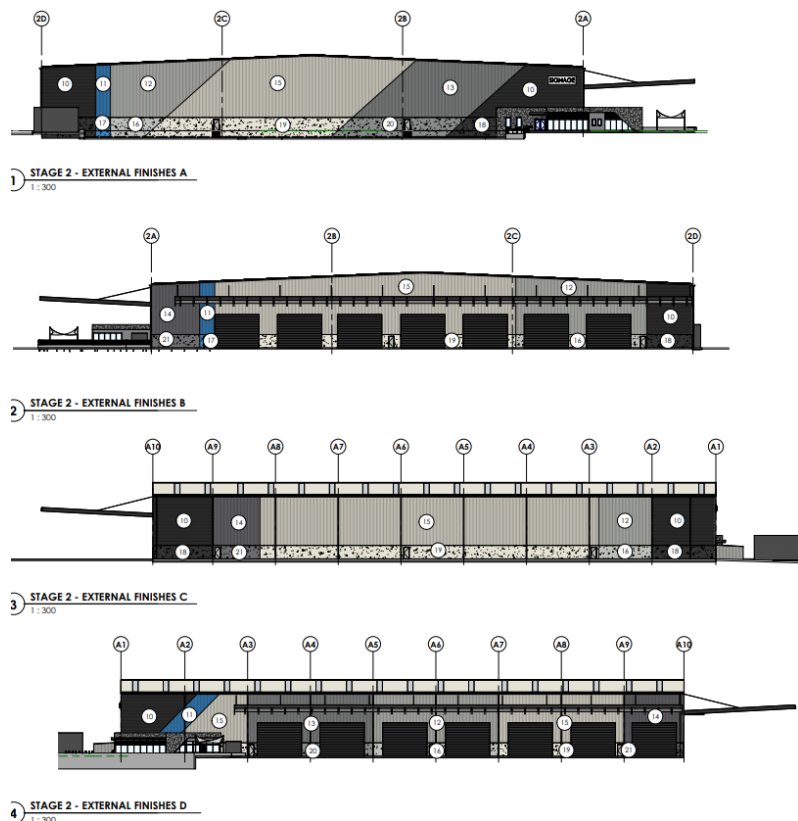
| Stage 2 Warehouse Elevations, Approved, As Modified
